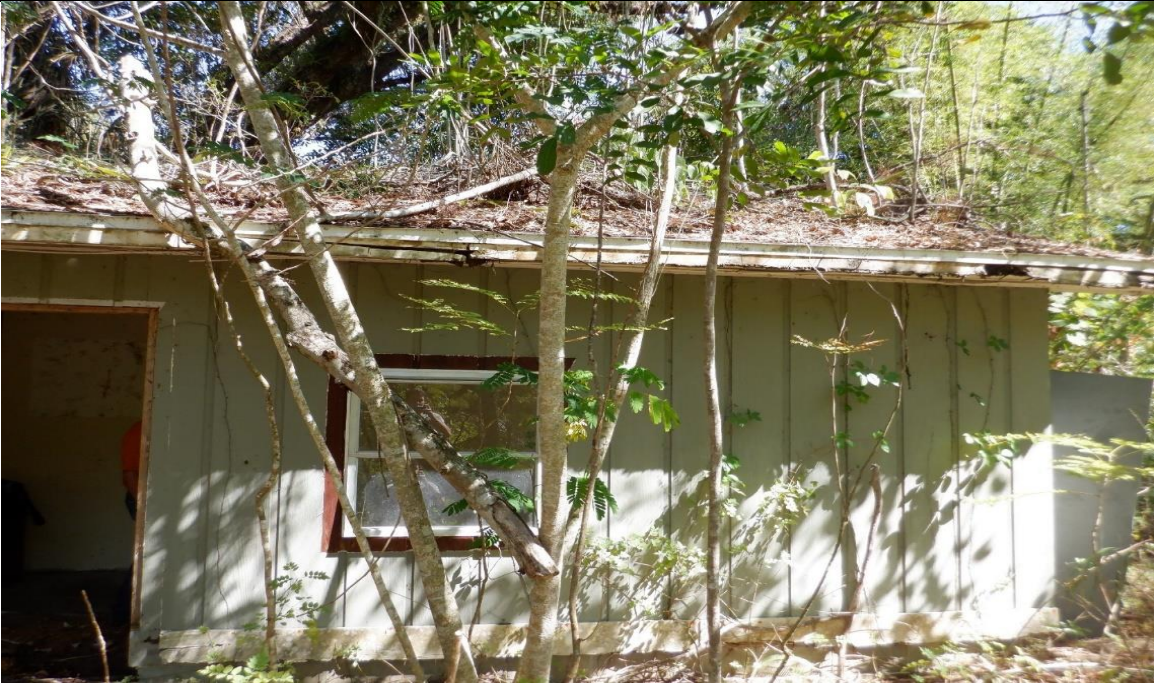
Structure 9 – One (1) story residential structure, wood framed, and addition is on a concrete slab.
